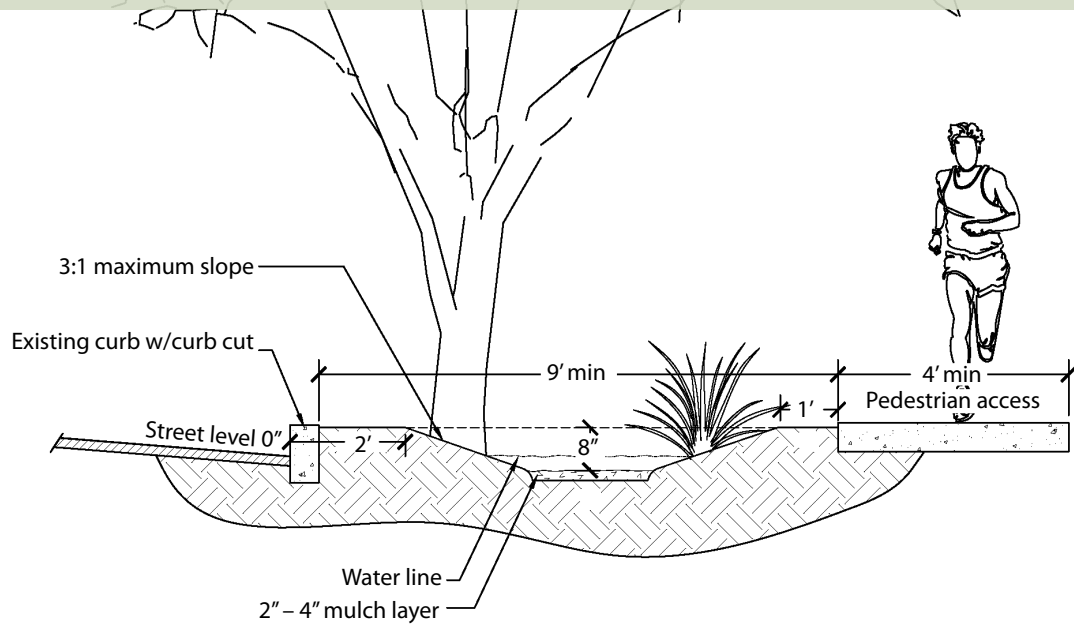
Section B. Typical cross-section of a basin with sloping sides, showing typical setbacks for a site on a residential street with on-street parking. For plan view, see Appendix.
